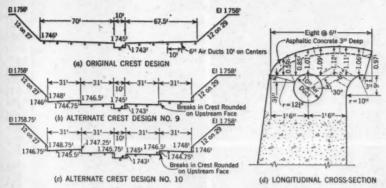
Crest Profiles and Section, Brown Canyon Barrier, Facing Upstream
